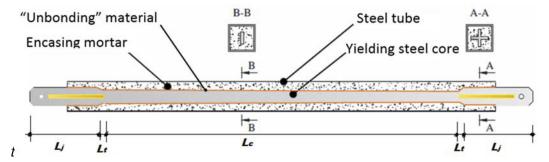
Details of a typical BRB ((a) P100-1/2013 [24]).
